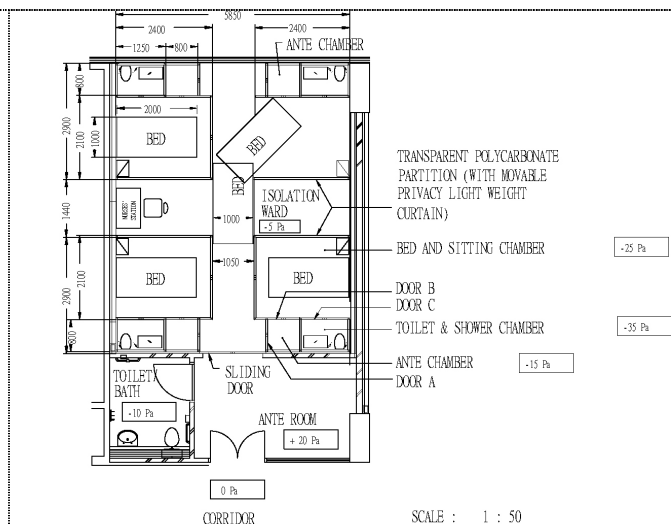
LAYOUT OF 4 PROPOSED MINI-EN-SUITES
